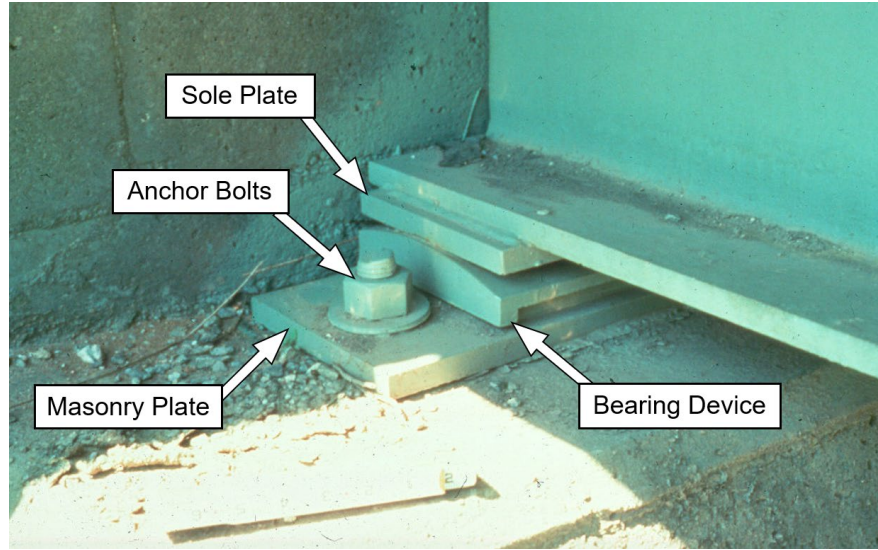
Basic Parts of a Typical Bridge Bearing
